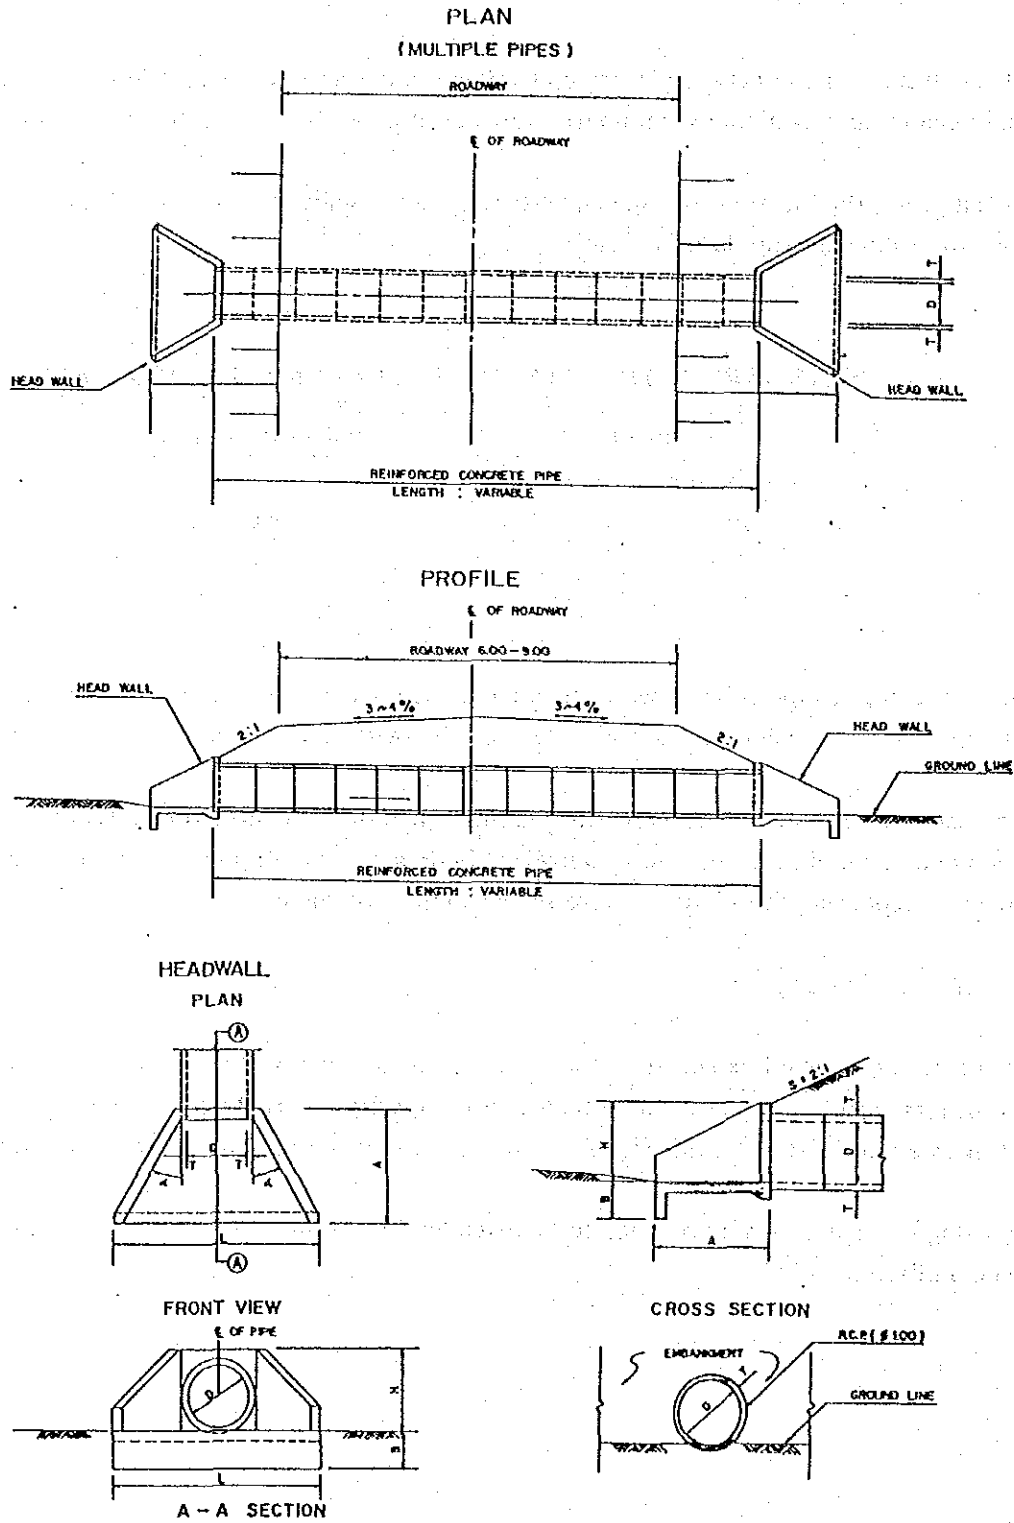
TYPICAL DESIGN OF PIPE CULVERTS
